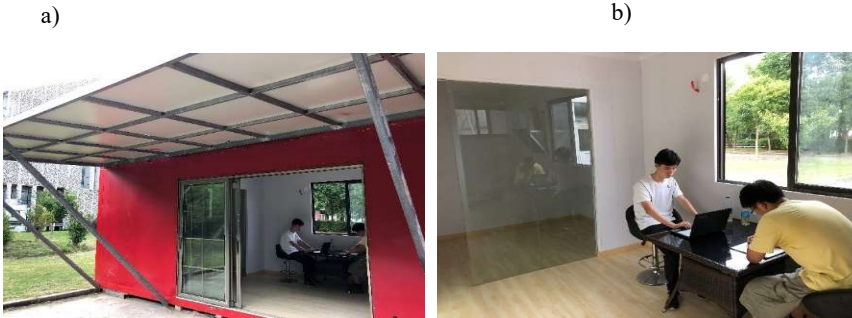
The demonstration building at Shanghai Jiao Tong University: a) The south façade and b) Inside the living room
